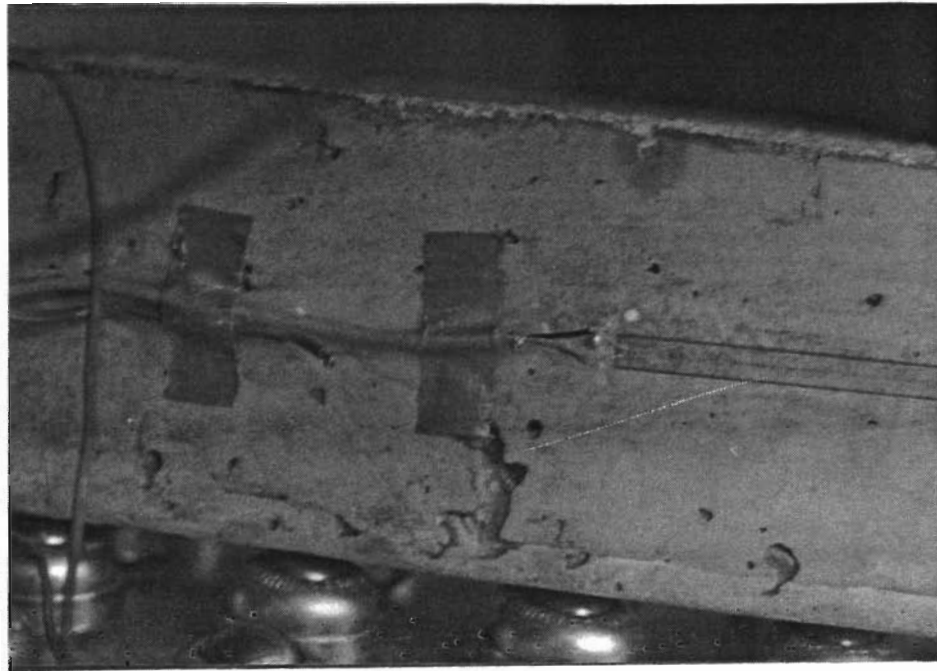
Mounted surface strain gage and thermocouple on test specimen.
